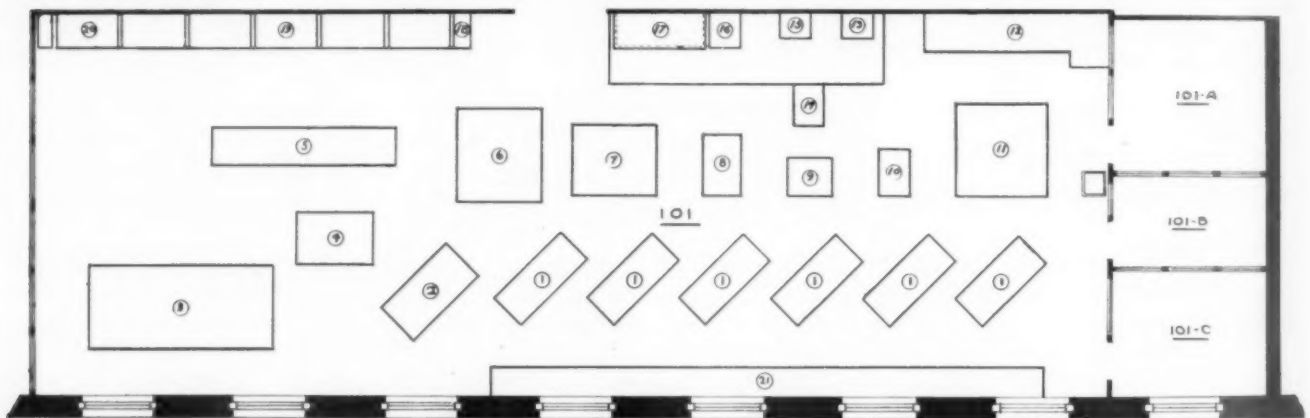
Metalworking Shop. Legend: 1. engine lathes, 2. spinning lathe, 3. sheet metal bench, 4. sheet metal machines, 5. sheet metal bench, 6. milling machine, 7. sharper, 8. wet grinder, 9. power hack saw, 10. drill press, 11. precision grinder, 12. molding unit, 13. crucible furnace, 14. anvils, 15. gas forge, 16. vise, 17. sink, 18. bench drill press, 19. metal bench, 20. buffer, 21. wall bench
